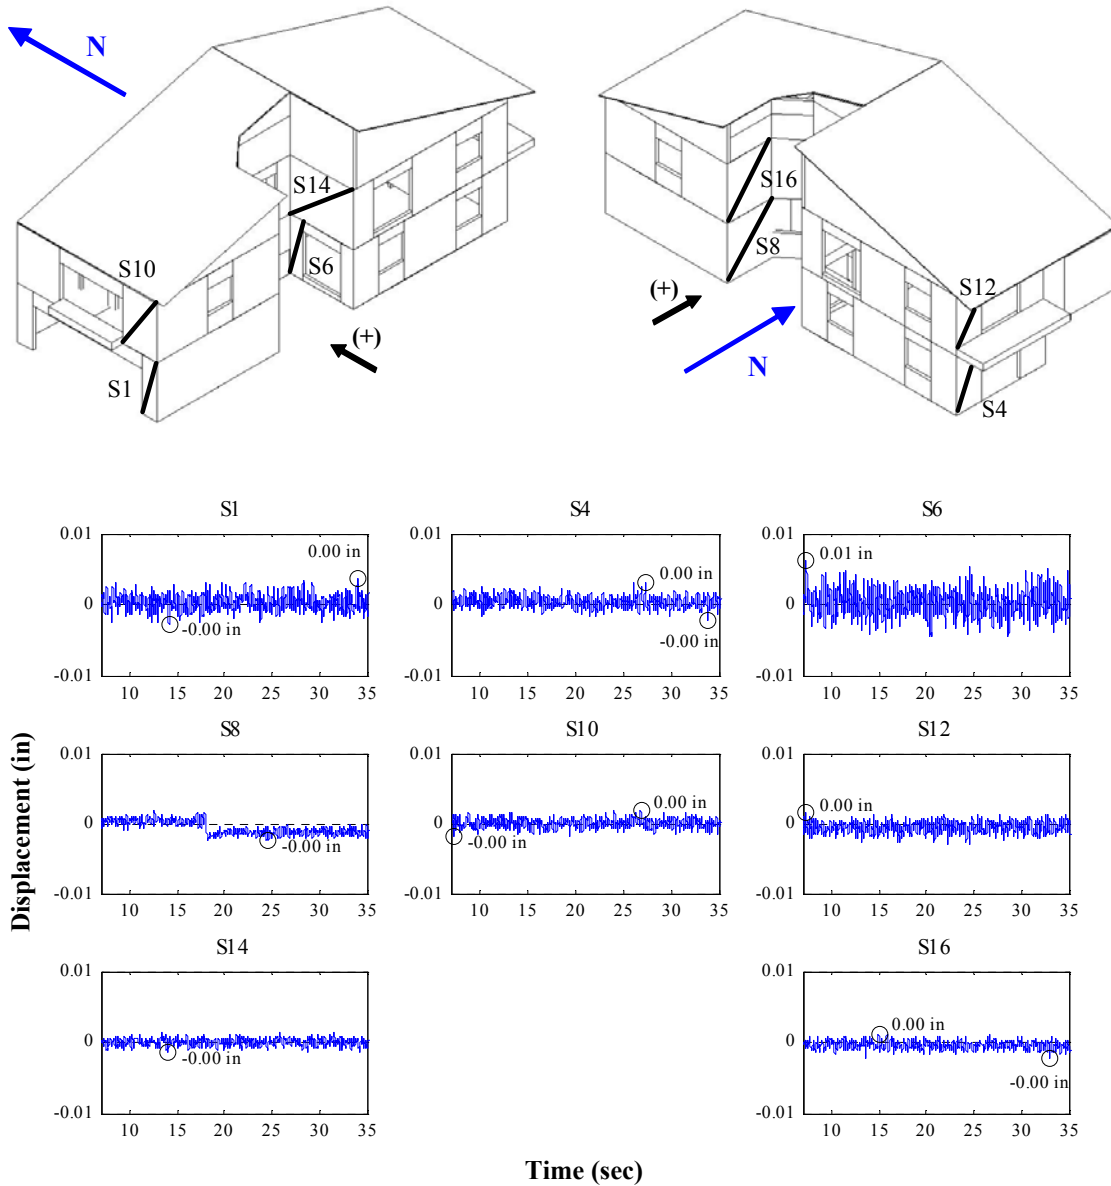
Wall deformations of north-south external walls for Test NWP5S01
